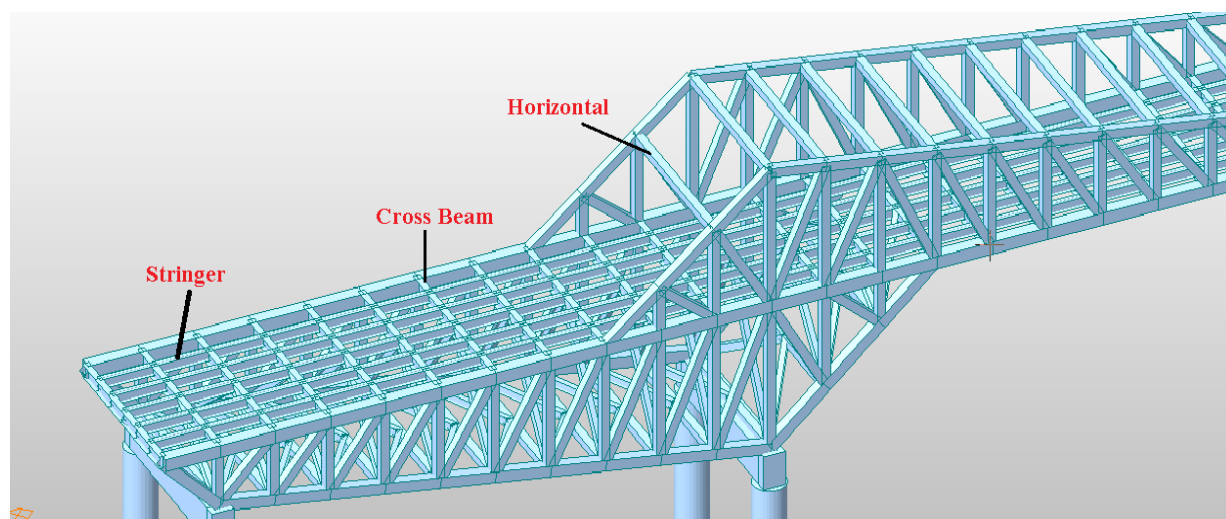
Stringer, Cross beam and Horizontals of the bridge
